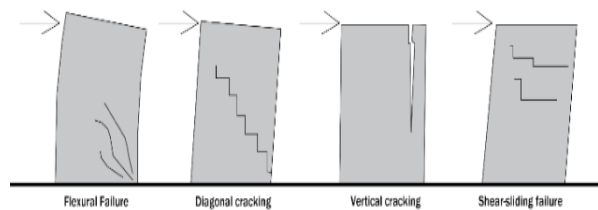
Determined failure types in the walls (drawn by the author via Autocad 2024)
